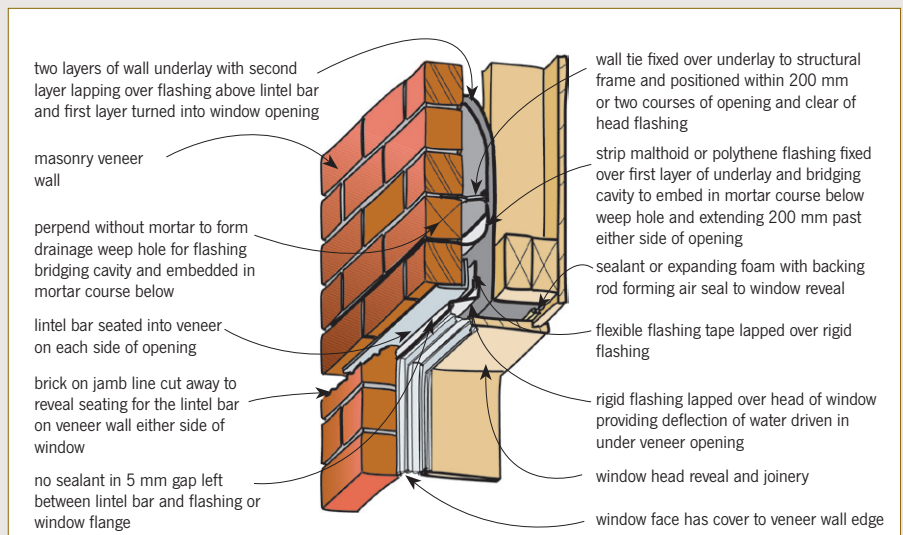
Window head construction for masonry veneer walls, with masonry continuing above the window.
